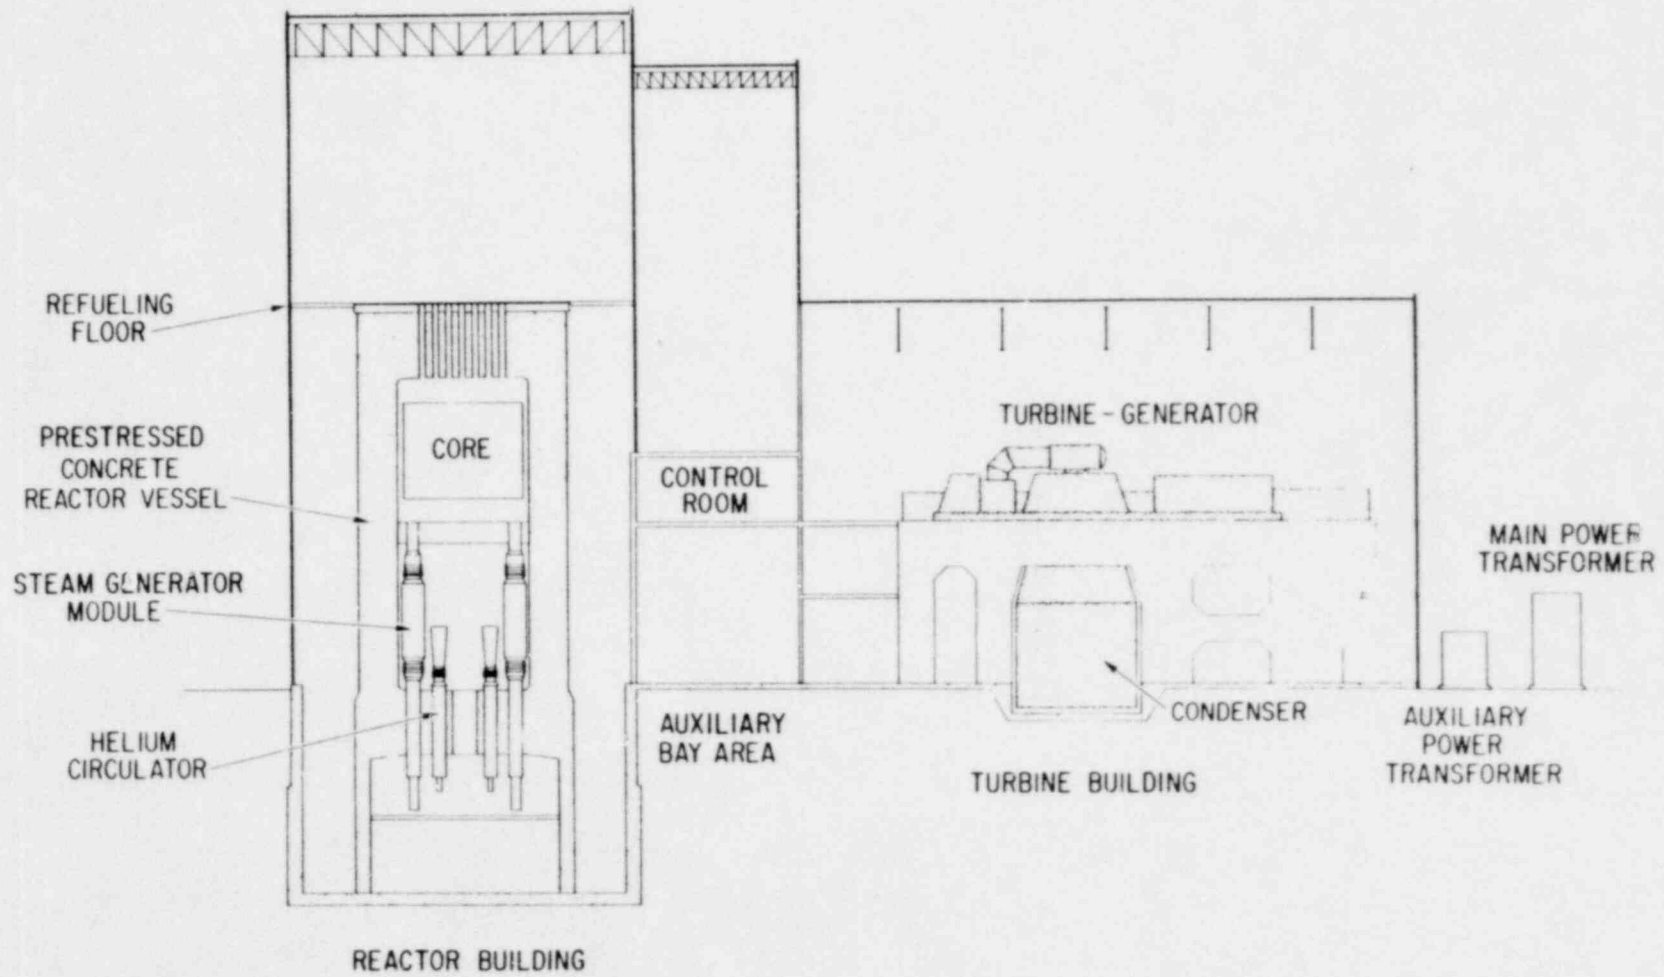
Section Through Reactor Building and Turbine Building
